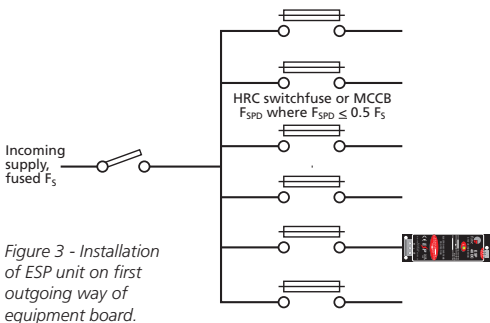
Installation of ESP unit on first outgoing way of equipment board.
